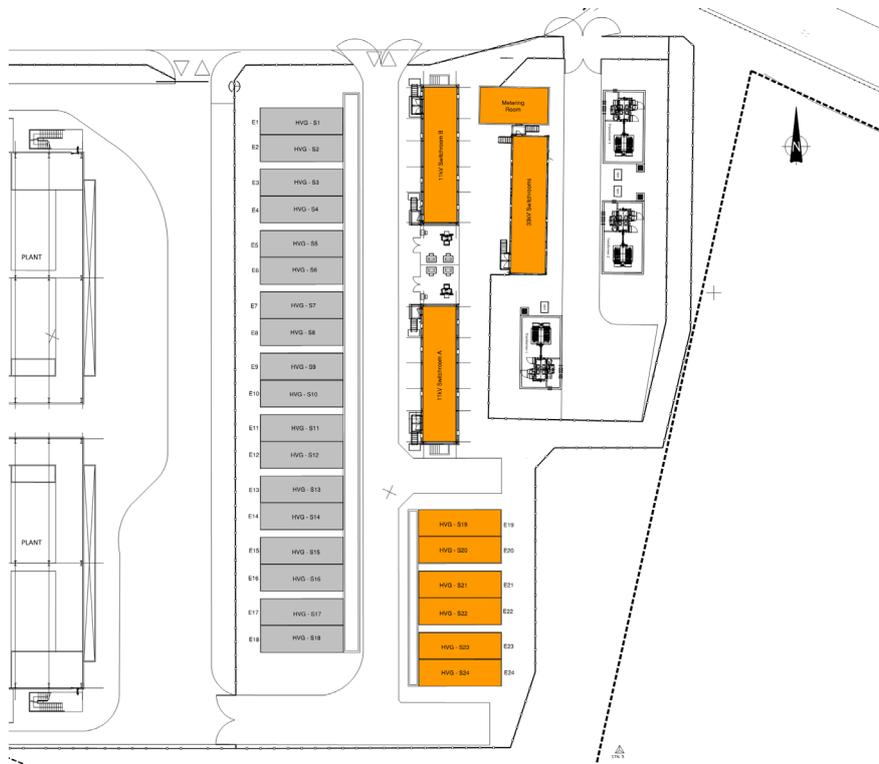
HV Generators Farm Facility Plan (in yellow and grey)
